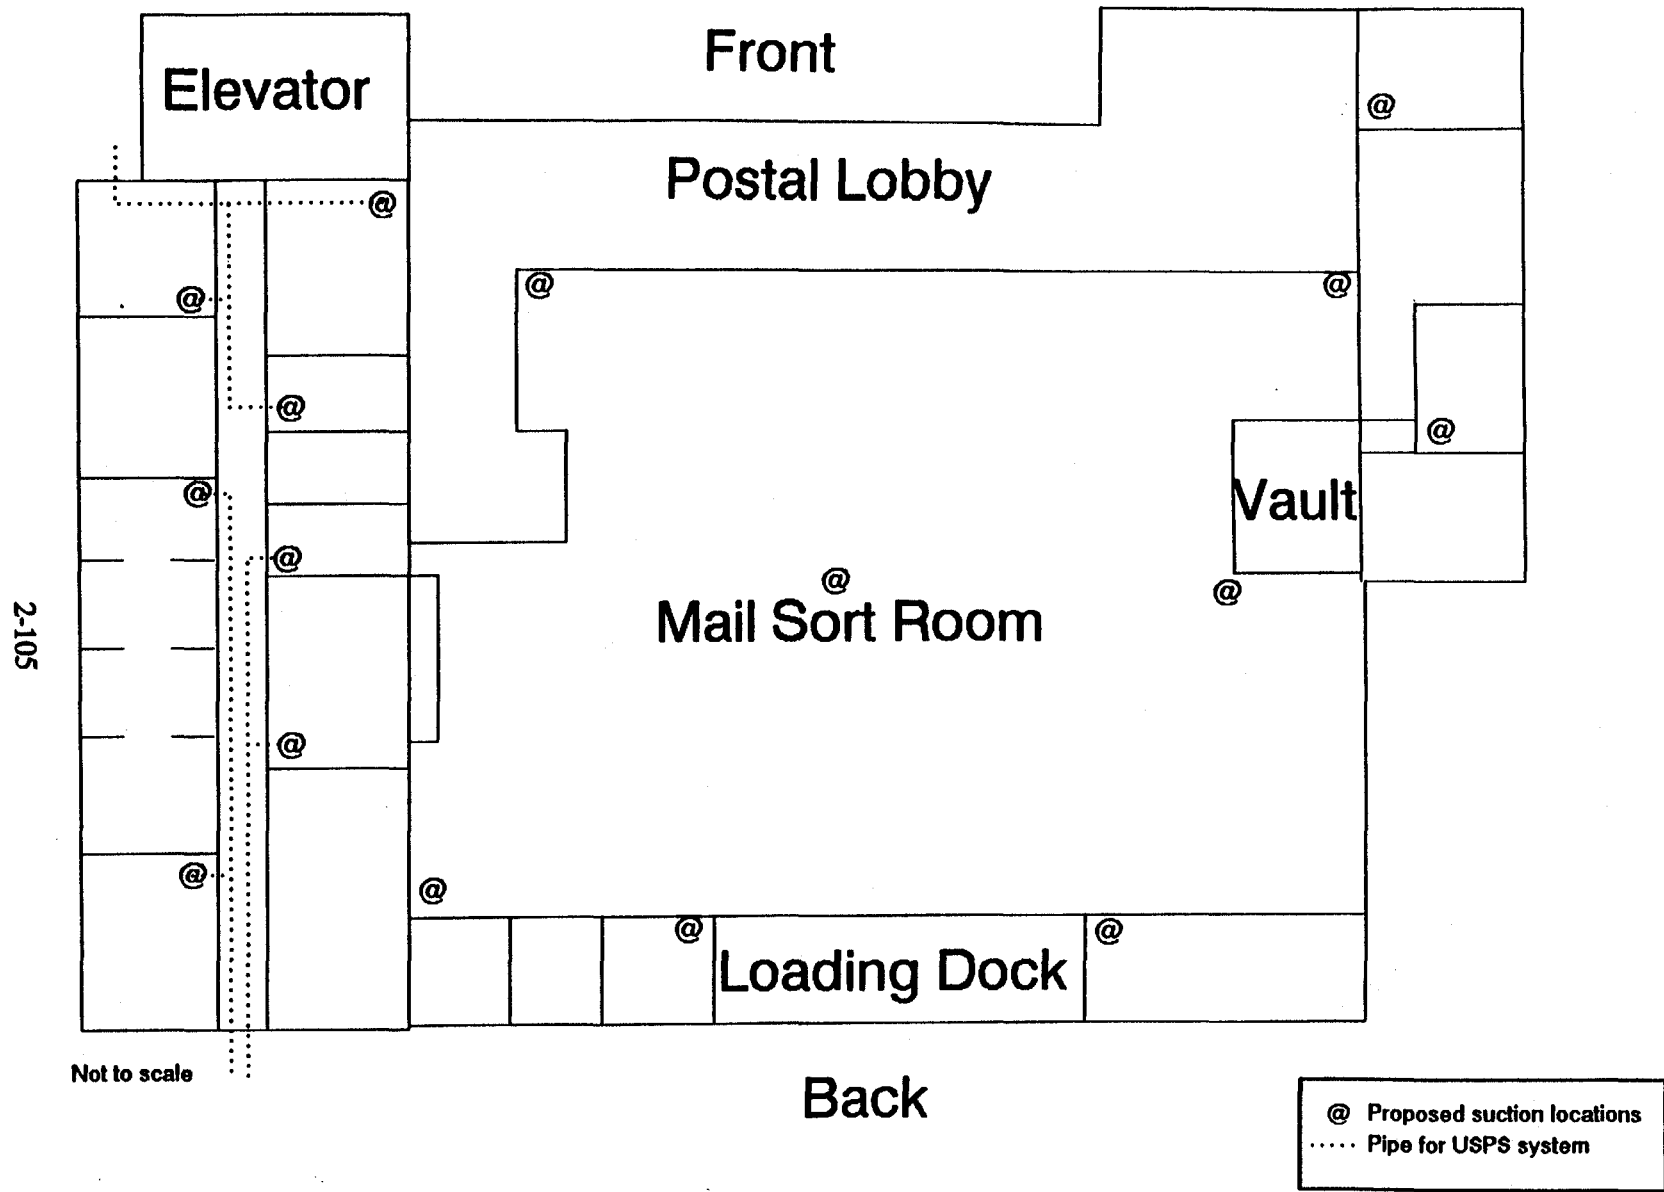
Ground-floor drawing for the U.S. Post Office in Talladega, Alabama (proposed suction locations).
